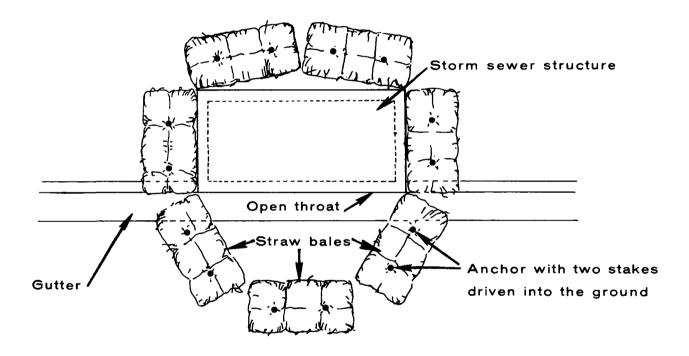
Temporary barrier of hay bales to prevent sediment-laden water from entering incomplete storm sewer system. (Revised from Reference No. 11).
